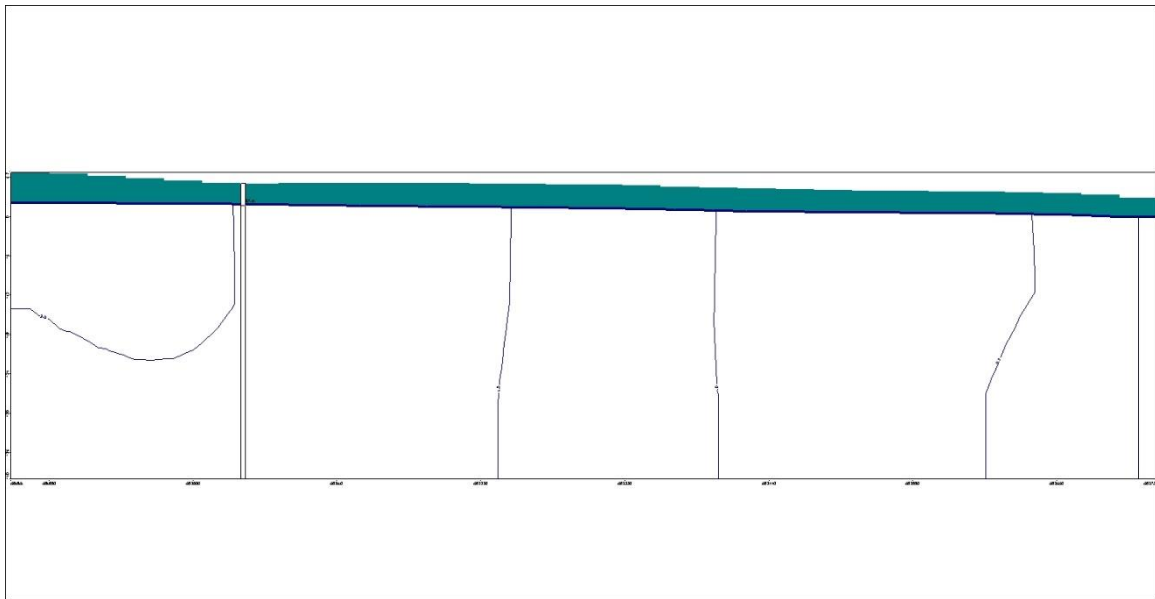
Longitudinal profile East- West crossing O'Connell (Row #53). O'Connell Sector
